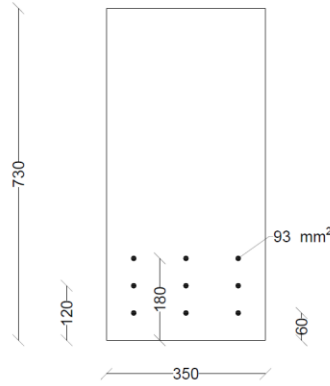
Cross-section of the investigated prestressed girder (dimensions in mm)
